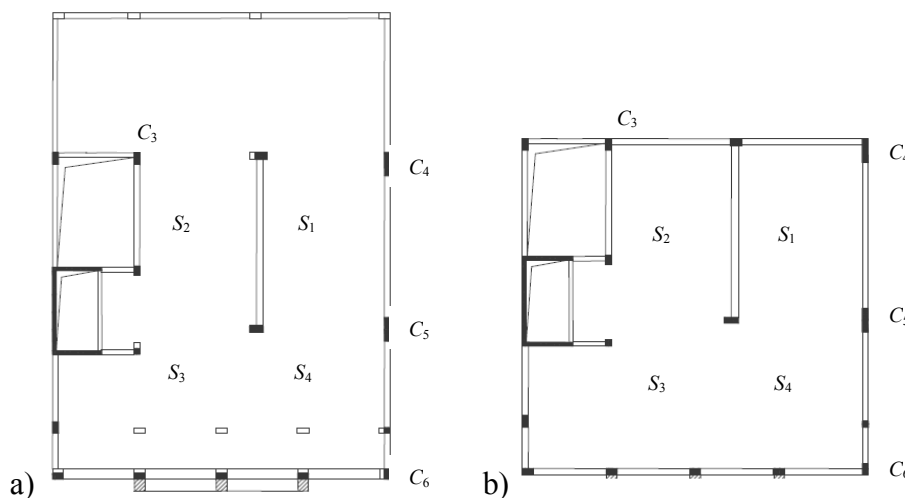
Plans of the: a) first floor; and b) second to fourth floors (and roof) of building 1.
